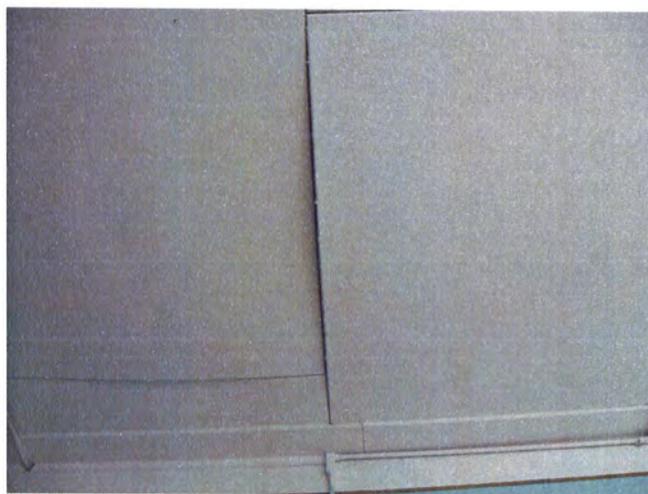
Direction: Southwest. Hangar # 5. Ceiling tile sample 0006 was taken from this office location.
